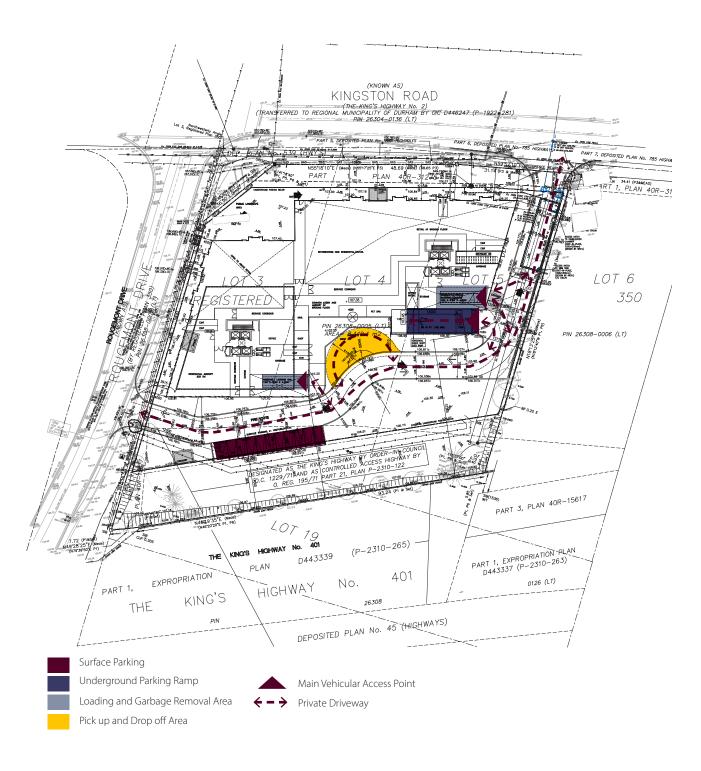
Ground floor plan showing vehicular circulation, surface parking, loading and garbage removal areas.
